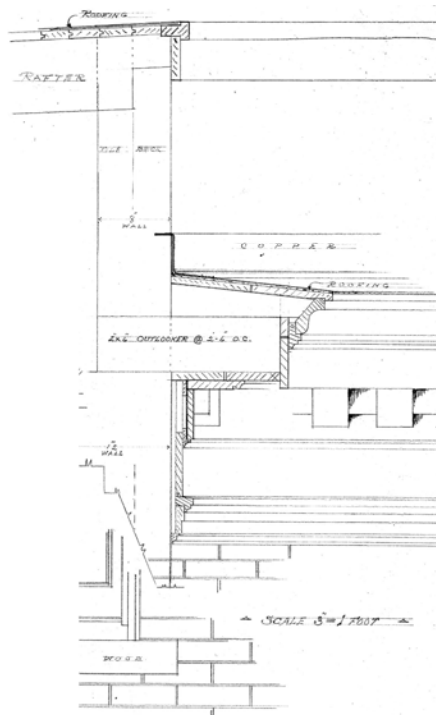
Original (circa 1928) typical cornice detail. Note, moisture ingress has potential to deteriorate “outlooker” and wall cavity if the cornice detailing is poor
